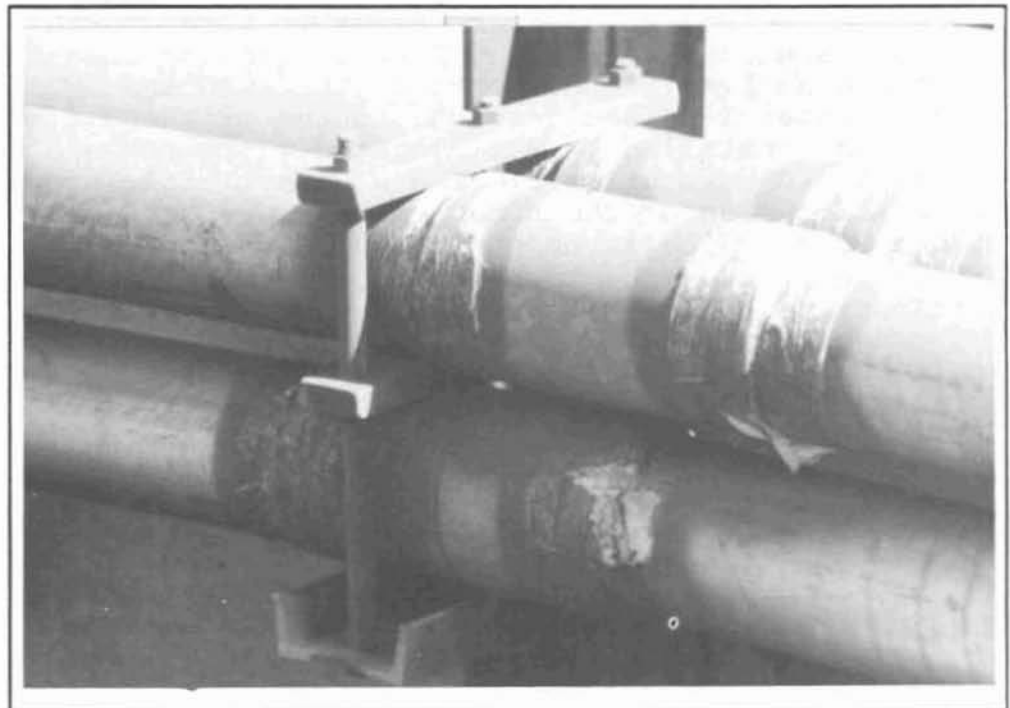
Details of the Fiber Optic Conduits and Hangers on a Cajon Canyon Road Bridge
